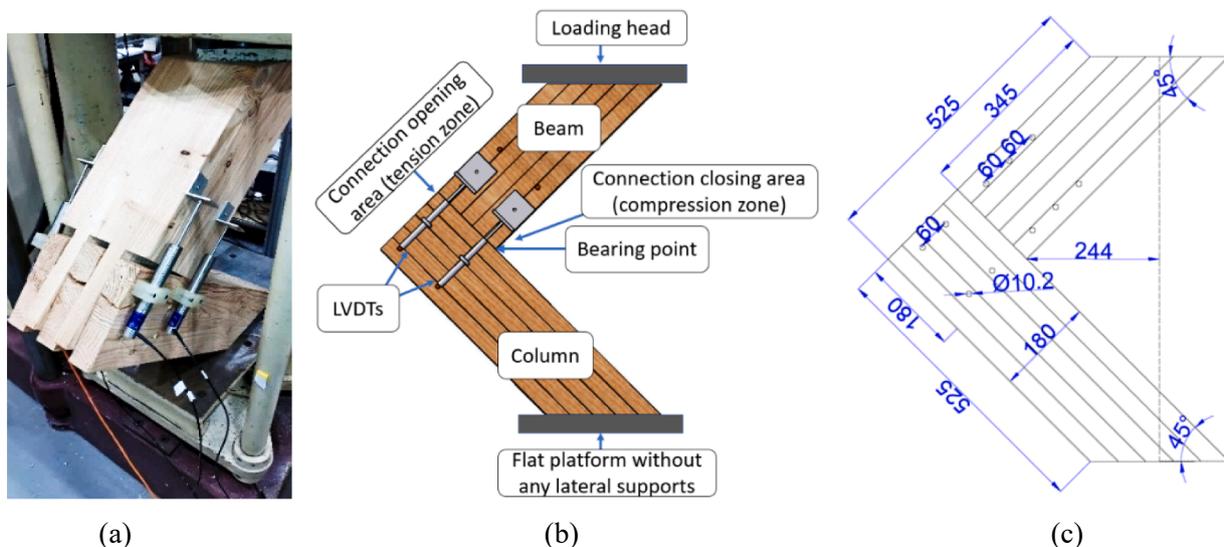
Connection testing, (a) test set up, (b) connection test set up components, loading direction and position of the LVDTs, and (c) geometry of Design-I-II showing lever arm distance. (Dims. in mm).
